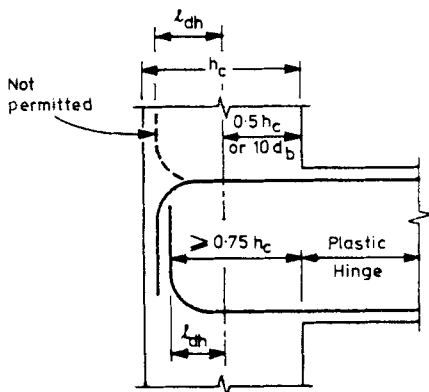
Anchorage of Beam Bars When Critical Section of Plastic Hinge Forms at Column Face [5].
